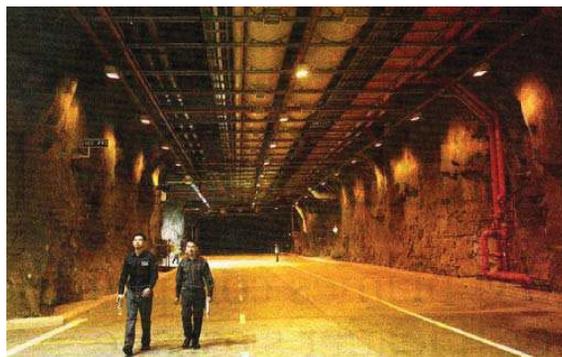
Underground Ammunition Facility (UAF) cavern after excavation (The Straits Times 2008).
